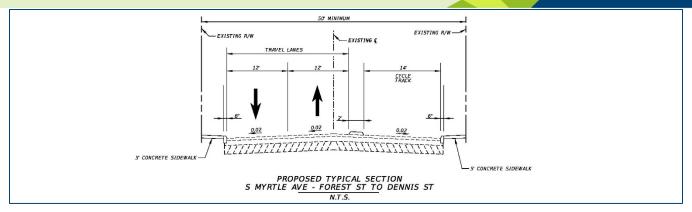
Proposed Typical Section (Segment 1, Forest Street to Dennis Street)
